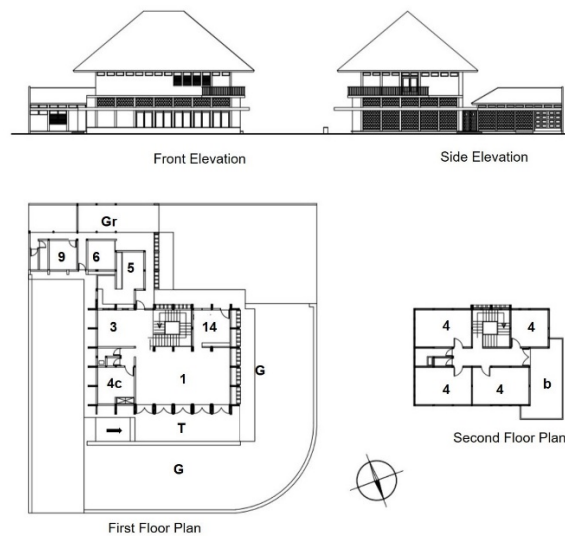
House at Kebajoran Baru P/3, Jakarta (1957)⁴⁾
